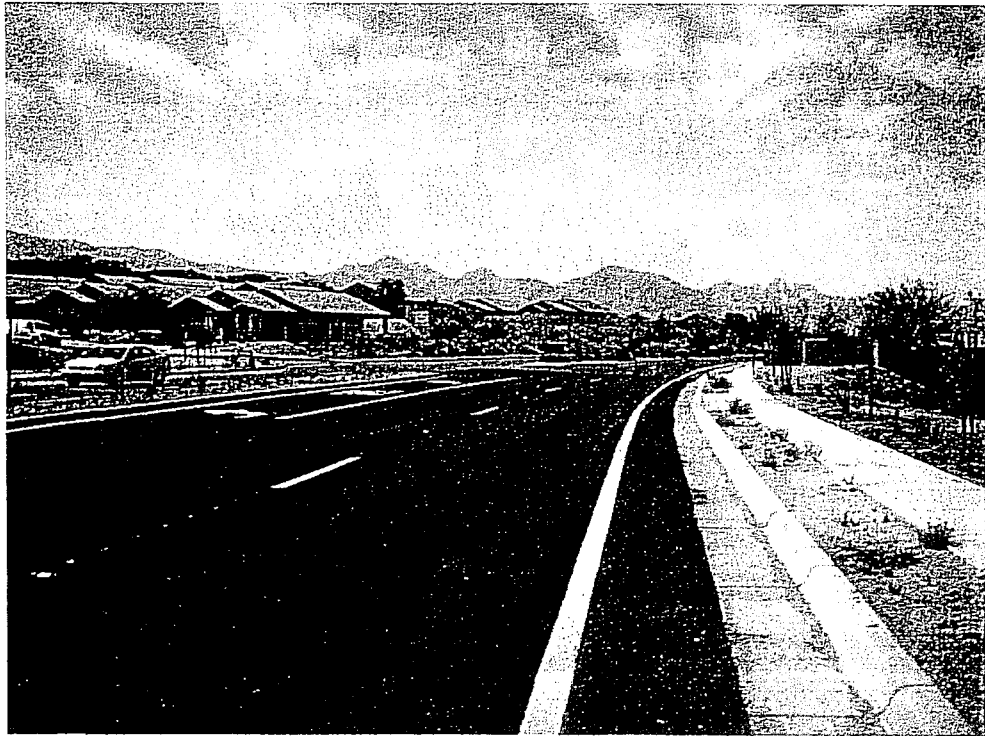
Street scene looking south on Eagle Crest Ranch Boulevard
